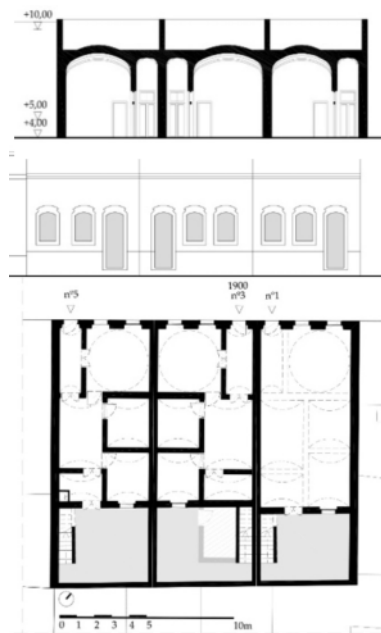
Elevation, section and ground plan of the set of houses located in standard lots in *Travessa das Amoreiras* (author’s drawing).
